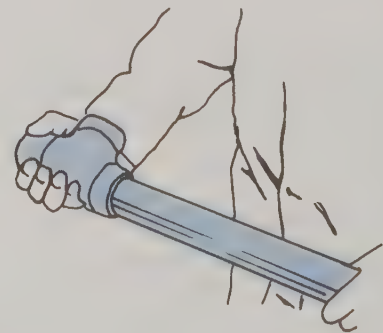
Twist the joint 1/4 turn as it is being assembled, and hold it in position until the cement begins to set. Correctly made solvent-welded joints will be leakproof and mechanically strong. (Nibco)
